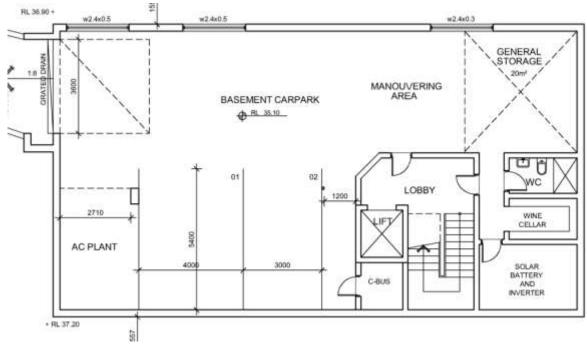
Extract of the recent set of plans of the proposed basement (source: N Lycenko Architect, received 09/11/2020)
